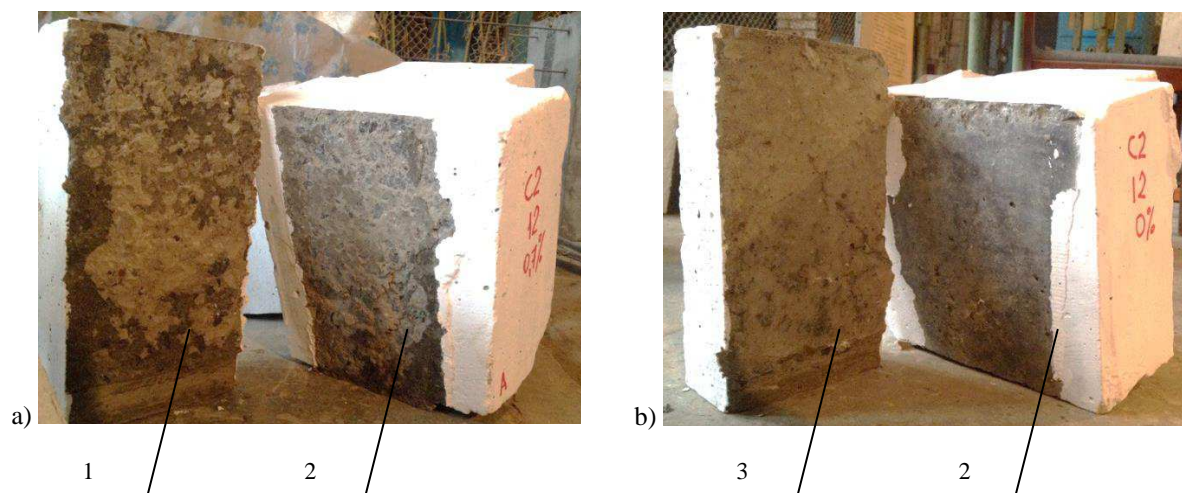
A general view of failure models: a) with admixture, b) without admixture; 1 – “new” modified concrete, 2 – “old” concrete, 3 – “new” concrete without admixture
